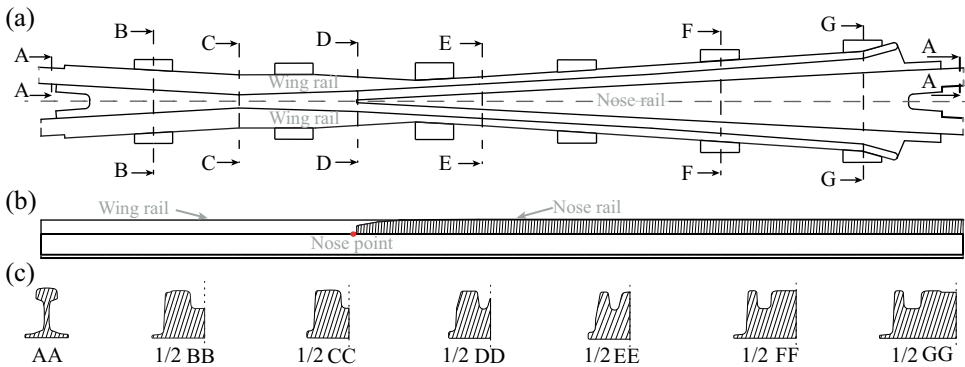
Drawing of crossing rail: (a) Global top view; (b) Vertical-longitudinal cross-sectional view; (c) Vertical-lateral cross-sectional view.
